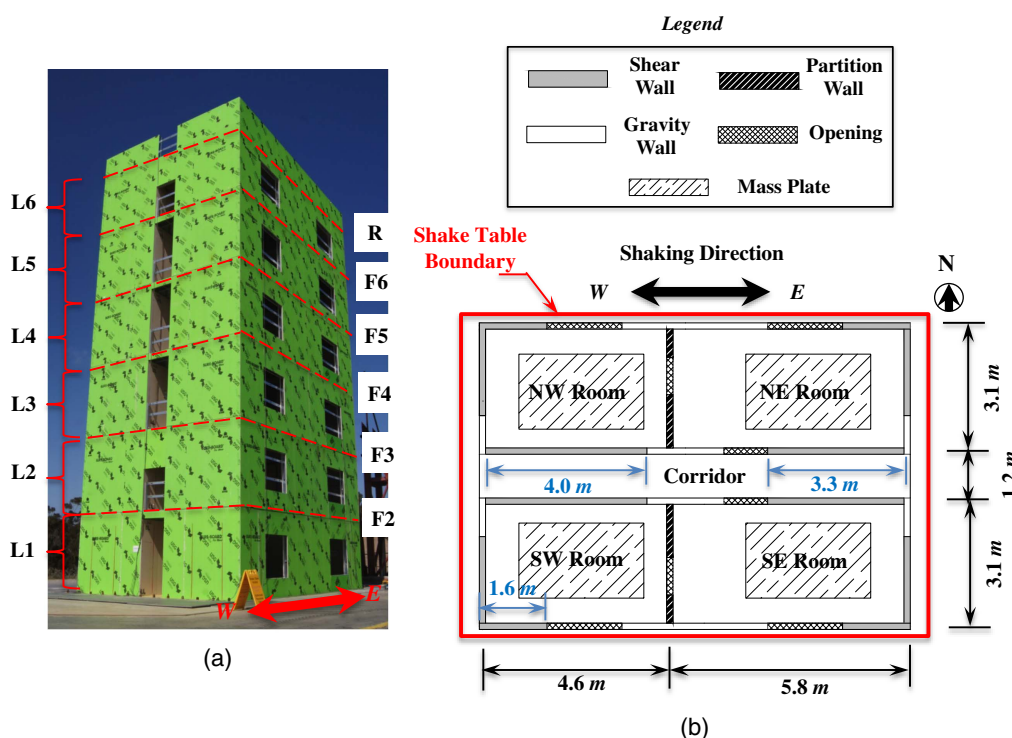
Test building: (a) isometric view of the building (L# denotes level number and F# denotes floor number) (images by Xiang Wang); and (b) schematic building plan layout typical of Floors 2 to 6. Floor 1 is identical sans the absence of transverse partition walls and mass plates. Interior arrow annotations denote the lengths of longitudinal walls (1 m = 3.3 ft).
